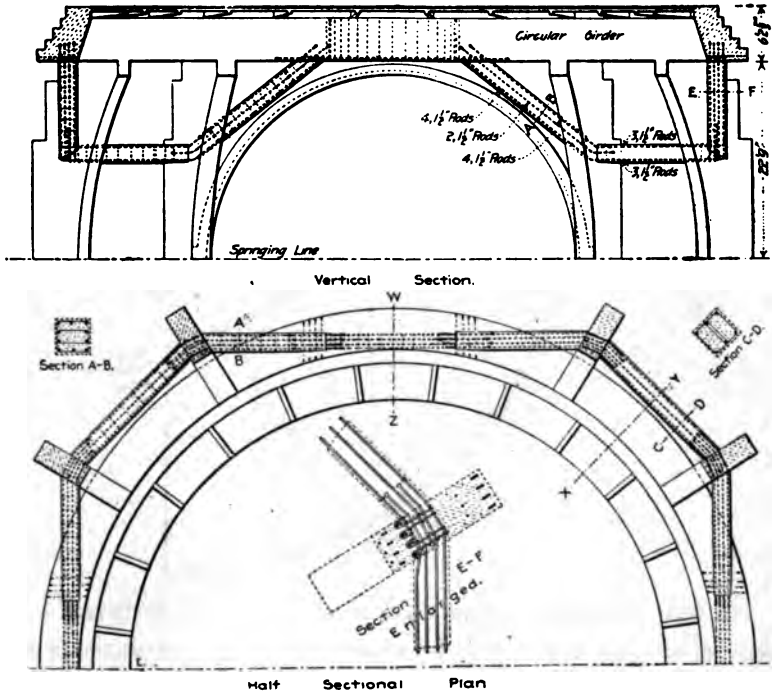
Elevation and Plan of Circular Girder, Naval Academy Chapel
